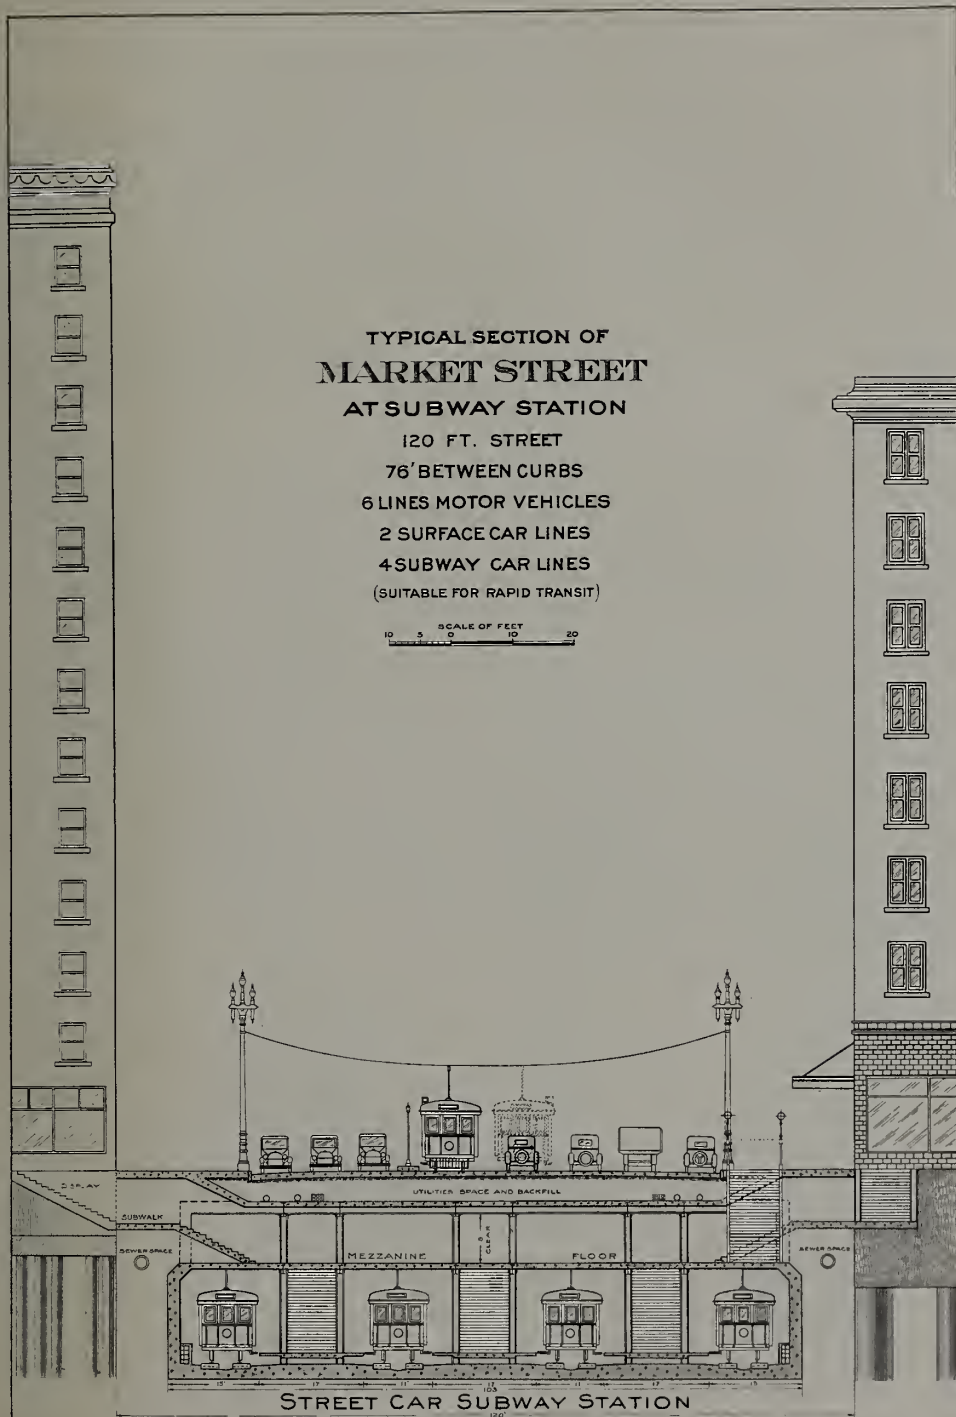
TYPICAL SECTION OF MARKET STREET FOUR TRACK STATION.
